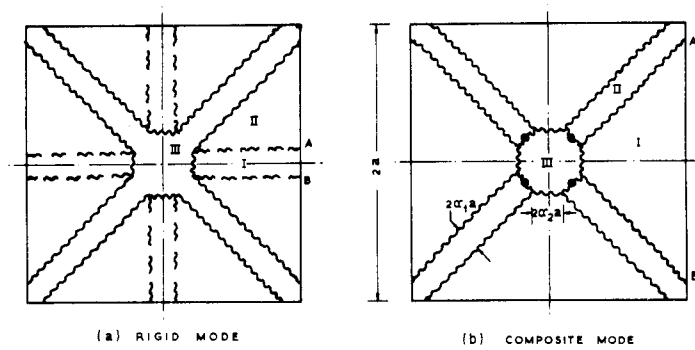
Failure modes in diagonal beam-slab footings.
